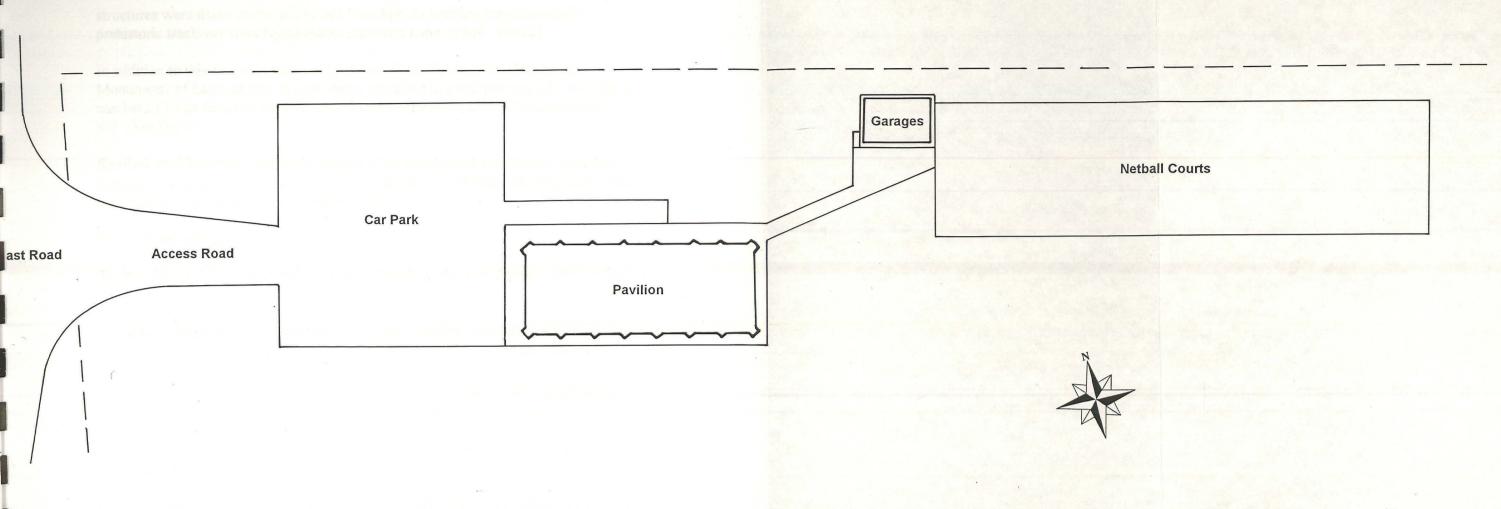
Plan of the north-west corner of the Development Site showing the layout of buildings and facilities monitored. Scale 1:500.
